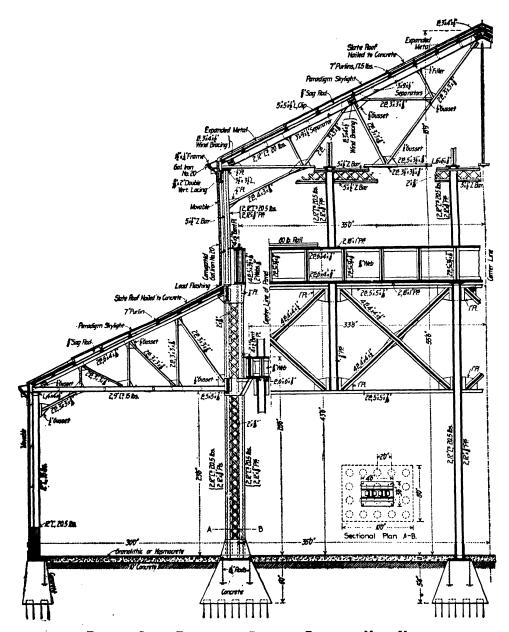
Steam Engineering Building, Brooklyn Navy Yard.
